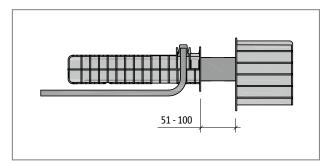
Schöck Tronsole® type Q...-XL: Installation variant joint width 51 mm - 100 mm
